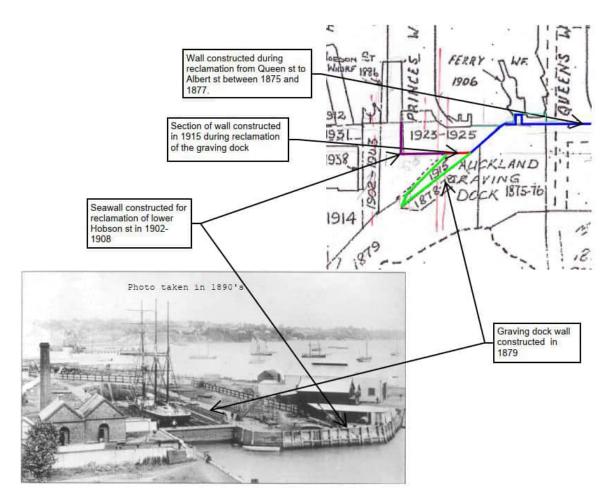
Construction and reclamation of the graving dock at the Site.
